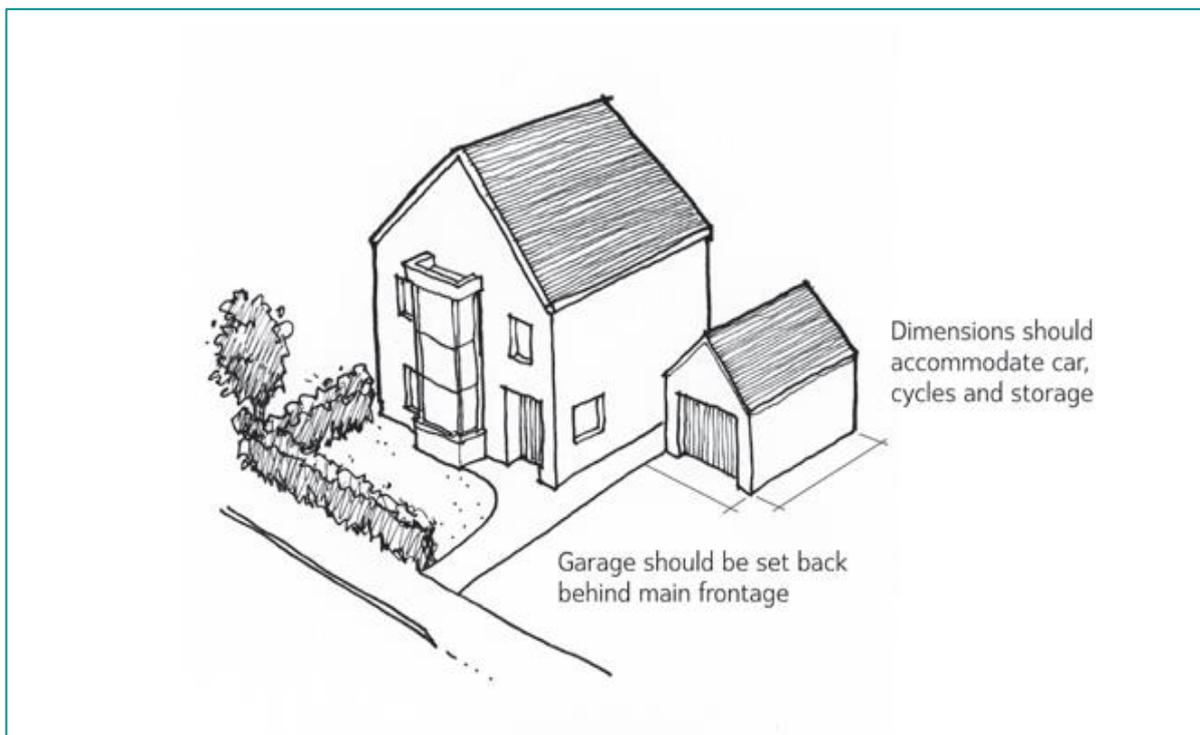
Shows on-plot parking with a well-designed garage set back to the side of the house and a planted front garden.
